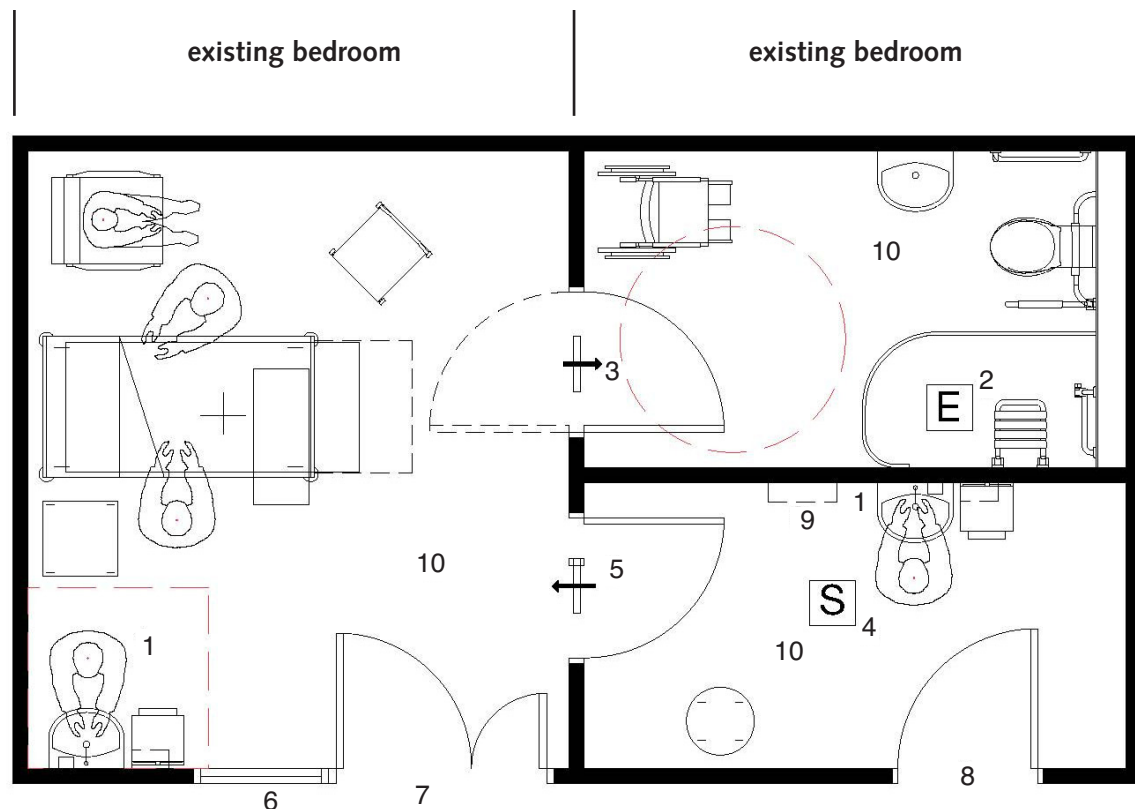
Upgrading two existing single-bed rooms to provide one single-bed room with en-suite facilities and personnel lobby (PPVL)
